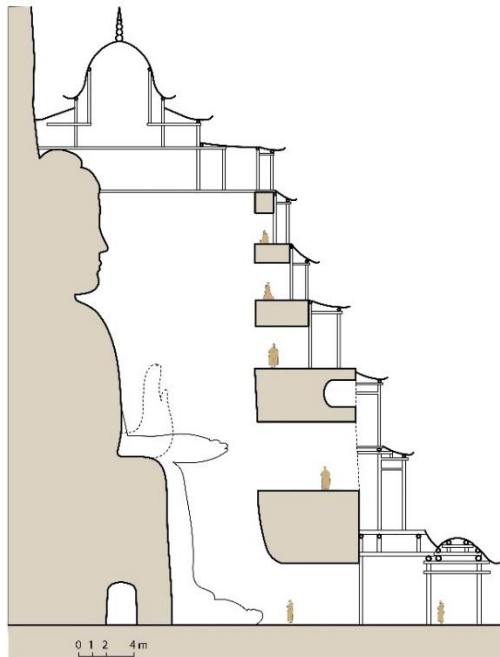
Sectional drawing of Mogao Cave 96, initially constructed in 695, façade reconstructed in 1927–35. Drawing by author.
